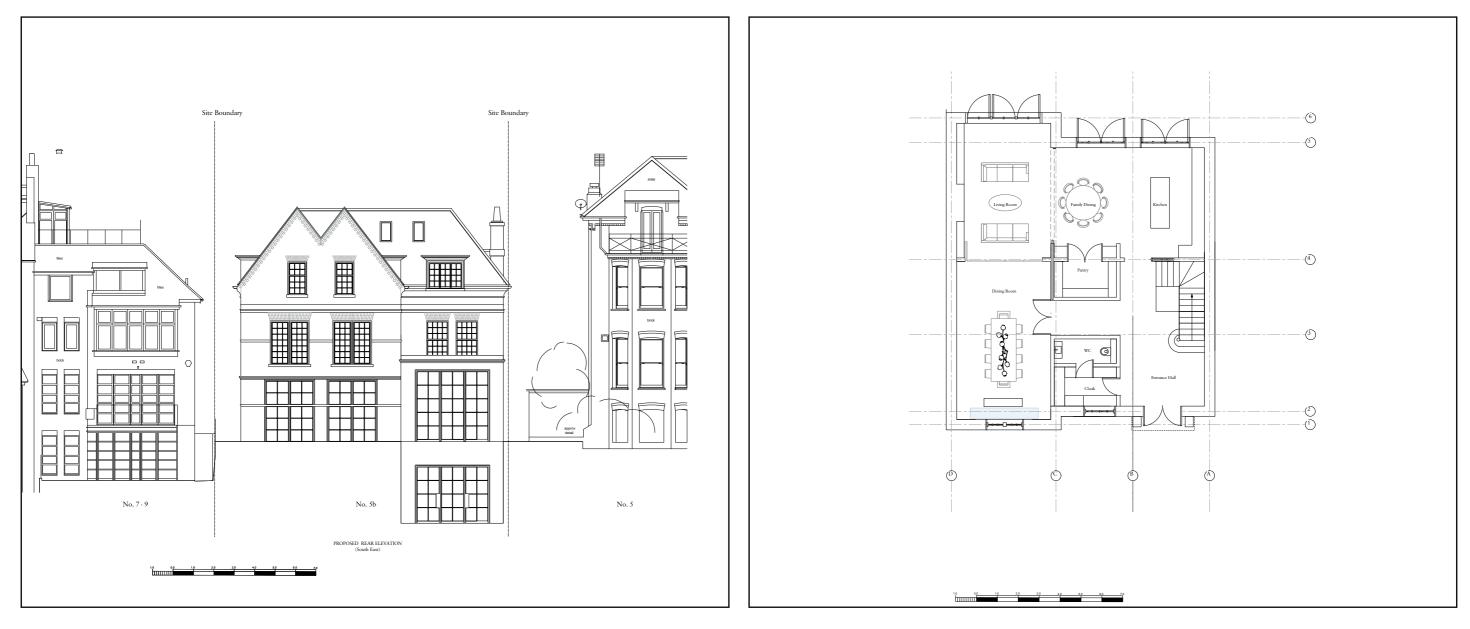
Proposed rear elevation (Charlton Brown Architects)
